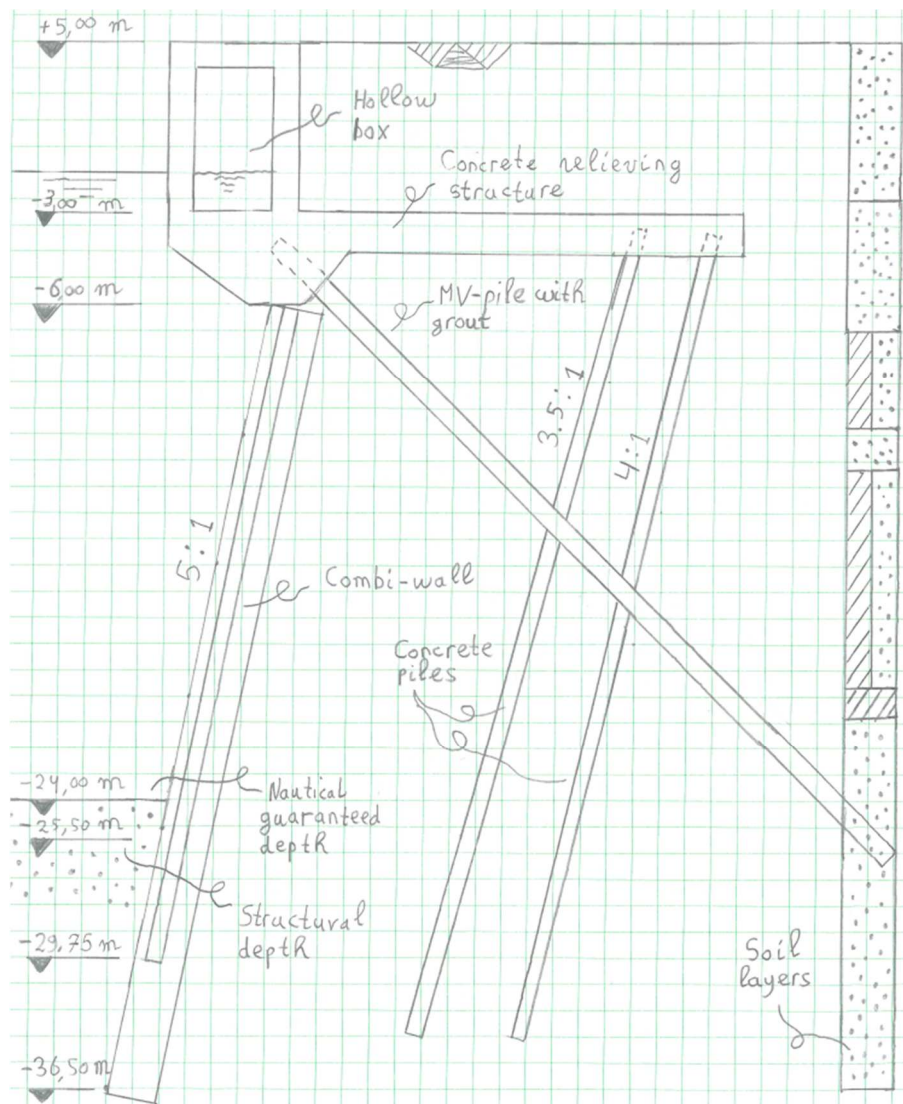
Cross-section of deep water quay wall in the Amazonehaven (Port of Rotterdam, heights in meter N.A.P.)
